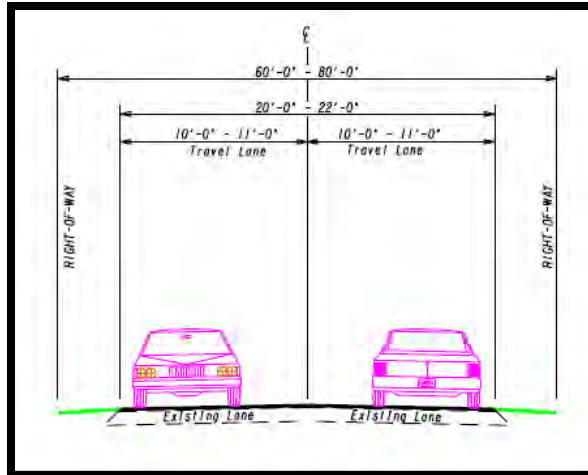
Proposed Typical Section – Alternative 4 & 5– Douglas St., Blackwell Rd., Wilson Dam Ave., and 20th Ave. to Second Entrance
